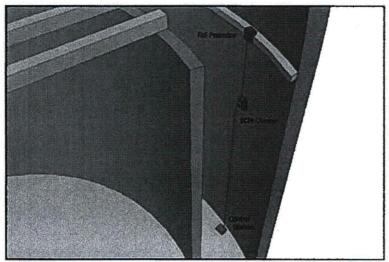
ICM Climber Deployed on Liner Wall Section of Containment Structure (click image for enlarged view)
